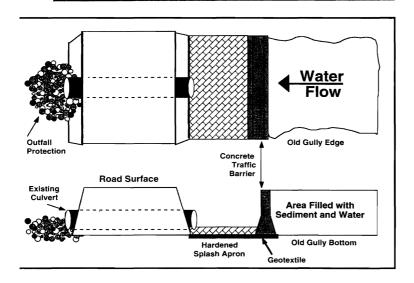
Construct an upstream dike using a concrete traffic barrier.
